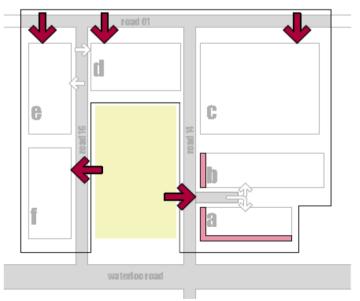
Location of the proposed vehicular access to the future buildings on the site. Source: Urban Design Report prepared by Fitzpatrick + Partners dated 22 September 2017.
